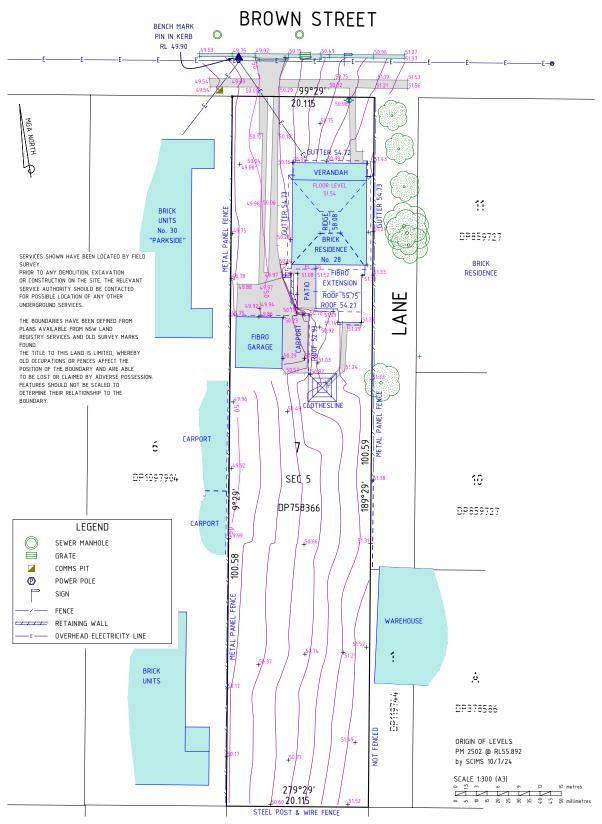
Site Survey Plan (David Cant Surveyors 2024)
